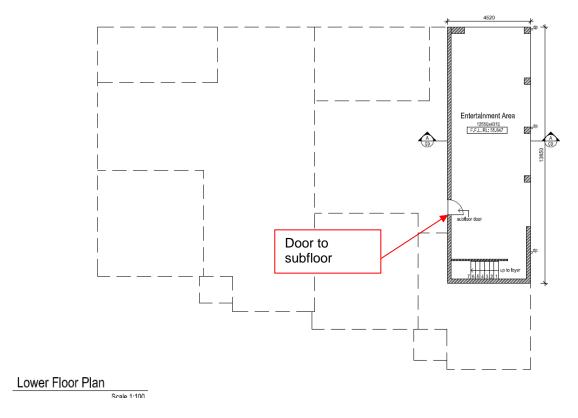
Lower floor plan showing door from entertainment area to subfloor
